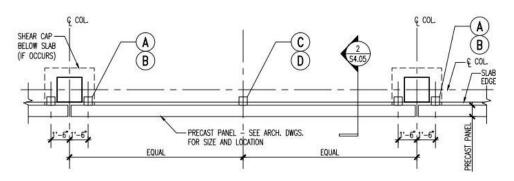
Precast Plan Detail – by Cagley and Assoc.
